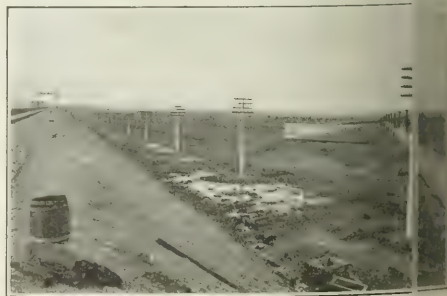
Concrete-Pole Line on Pennsylvania Railroad Extension.
